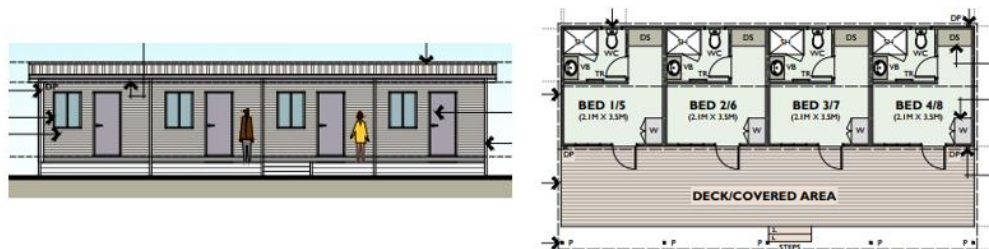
Elevation and floorplan of RWA: Dolphie, December 2025
